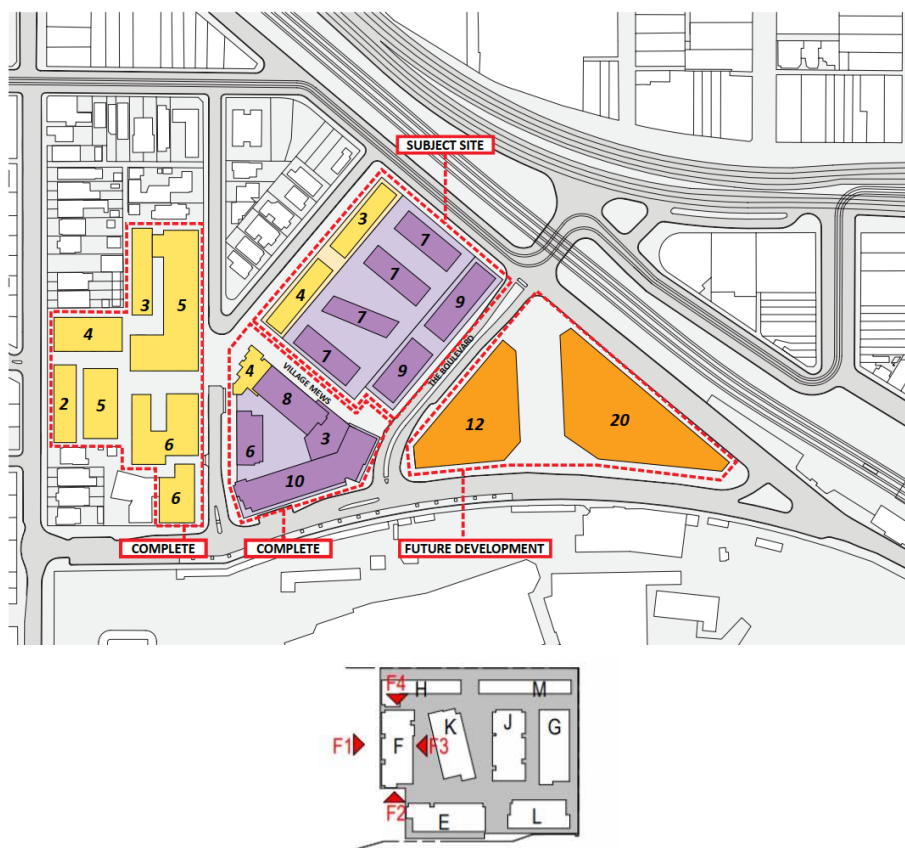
Extract of architectural plans showing building identification and heights (Appendix G)
